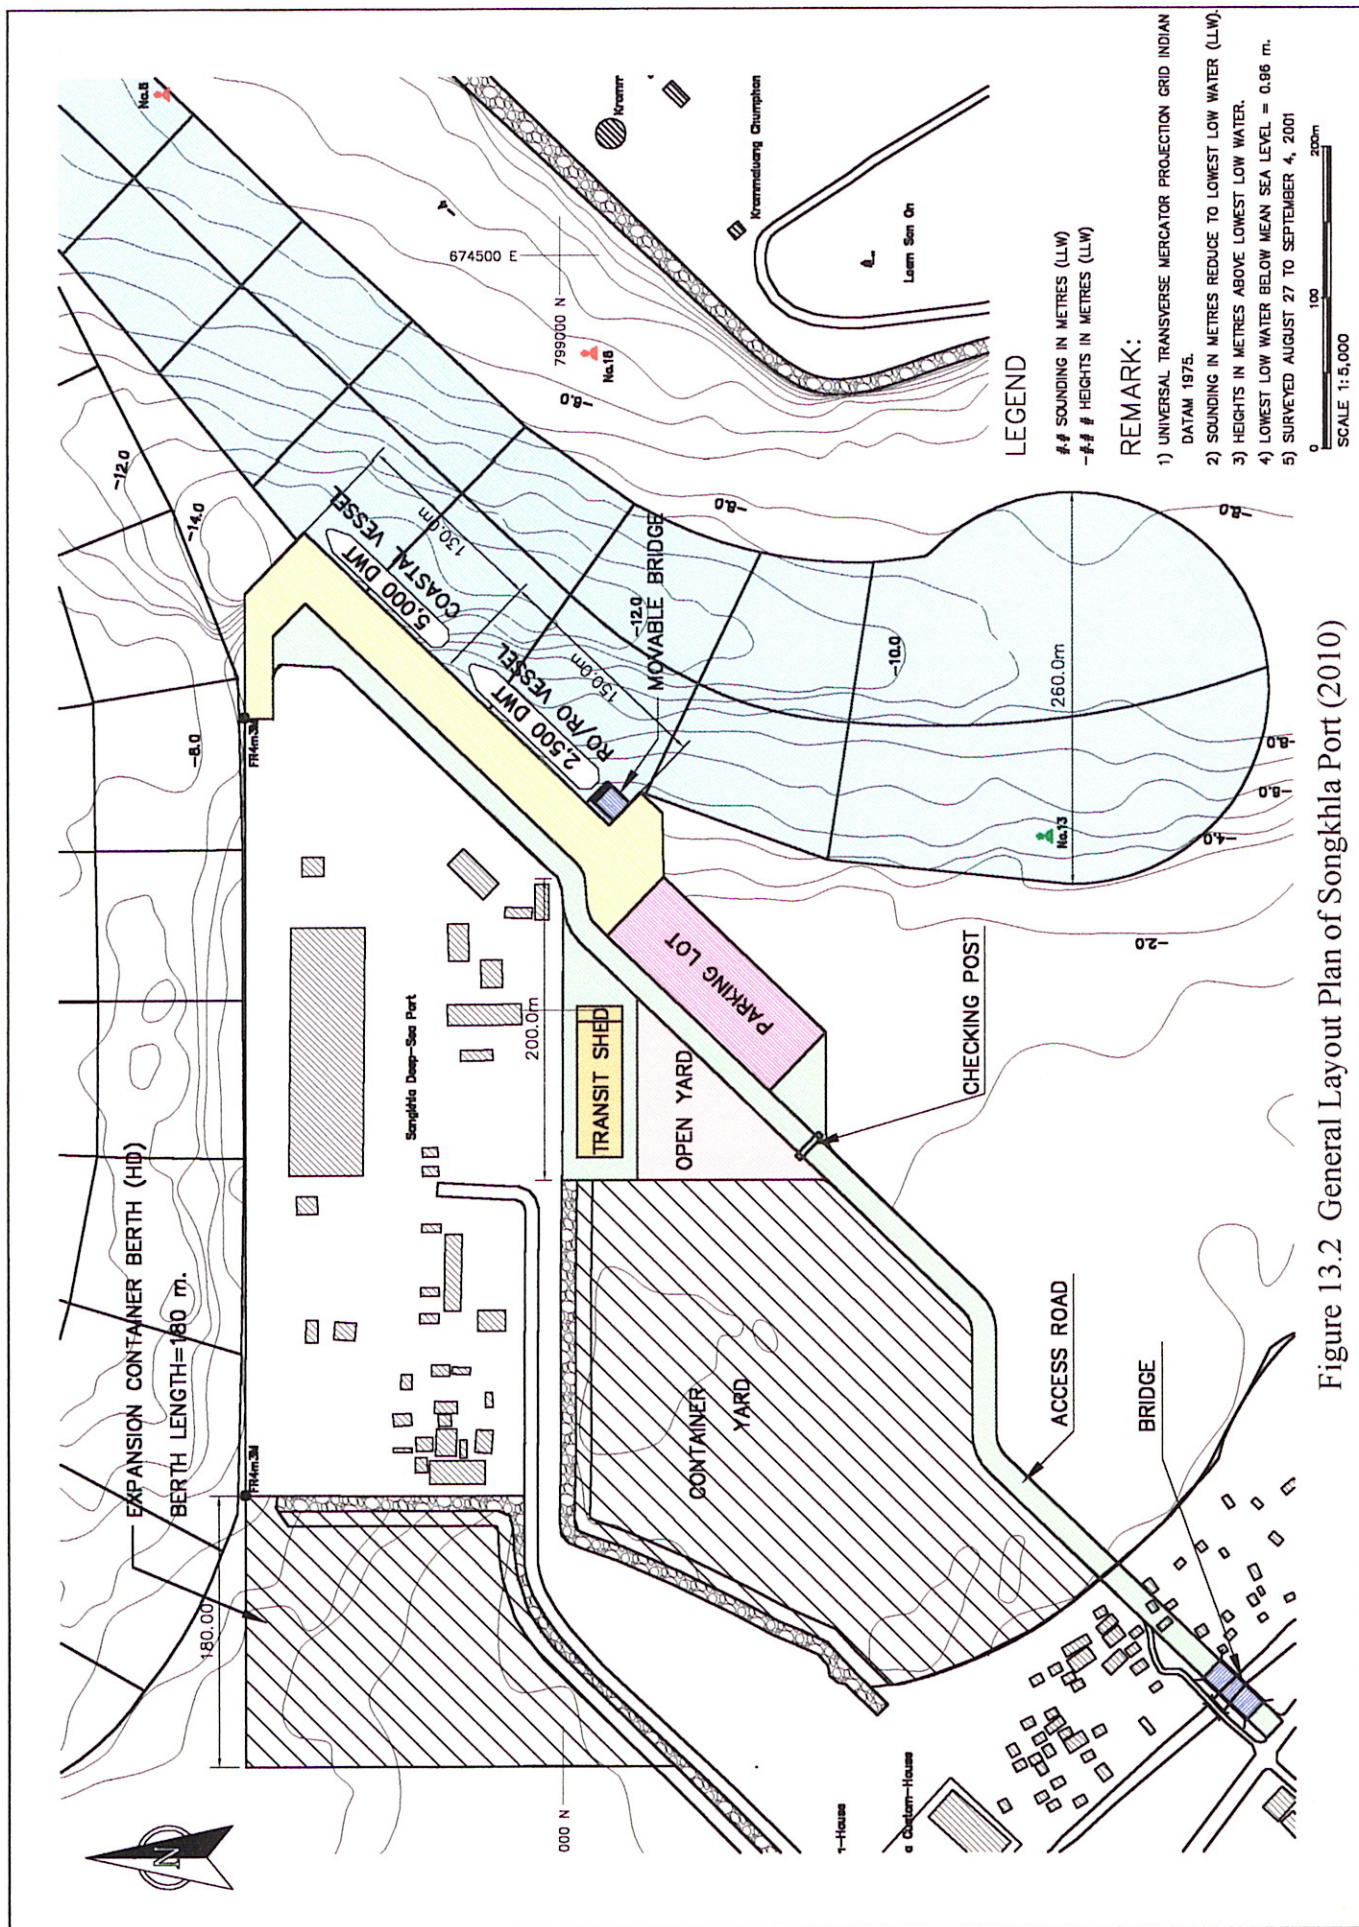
General Layout Plan of Songkhla Port (2010)
